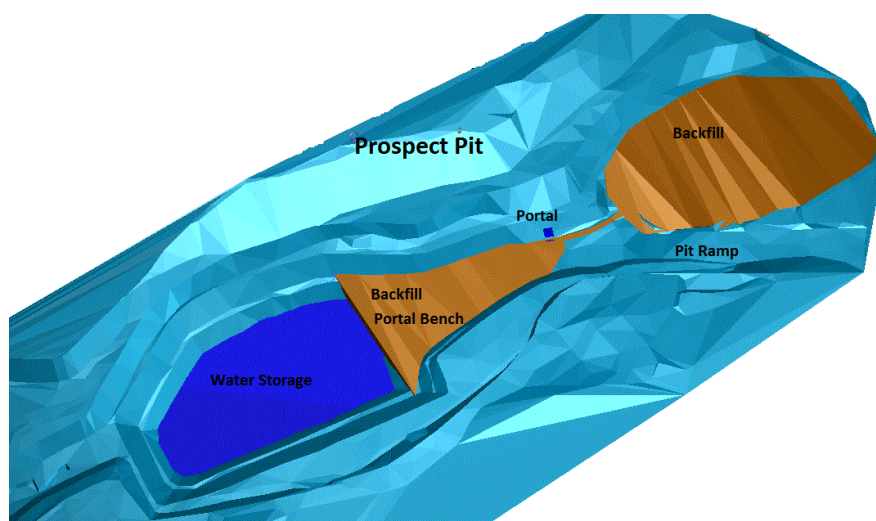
CONCEPTUAL PROSPECT PIT WASTE ROCK STORAGE AREAS (PRIOR TO DEWATERING)
